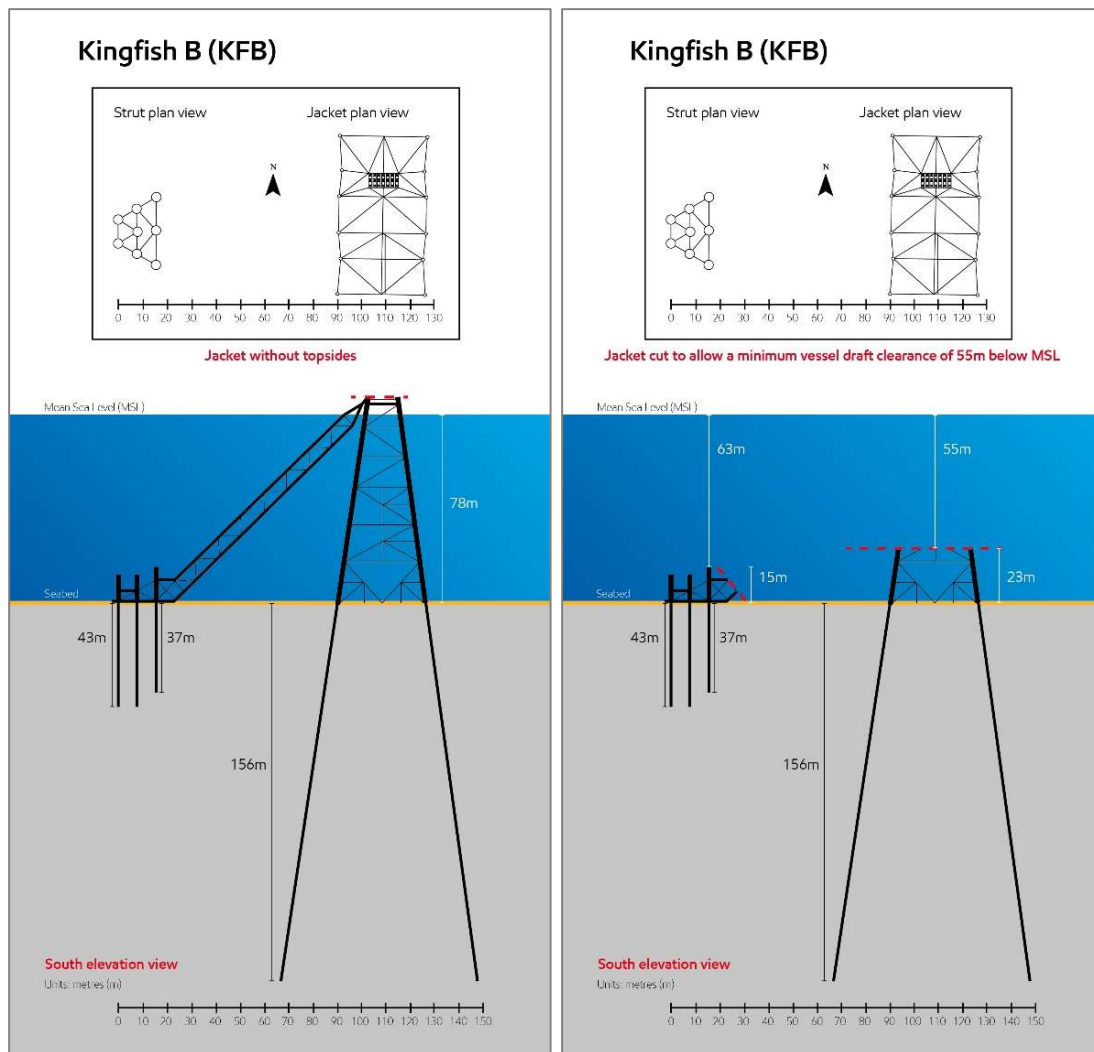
Kingfish B Steel Piled Jacket without topsides (left) and under proposed end state (right)
